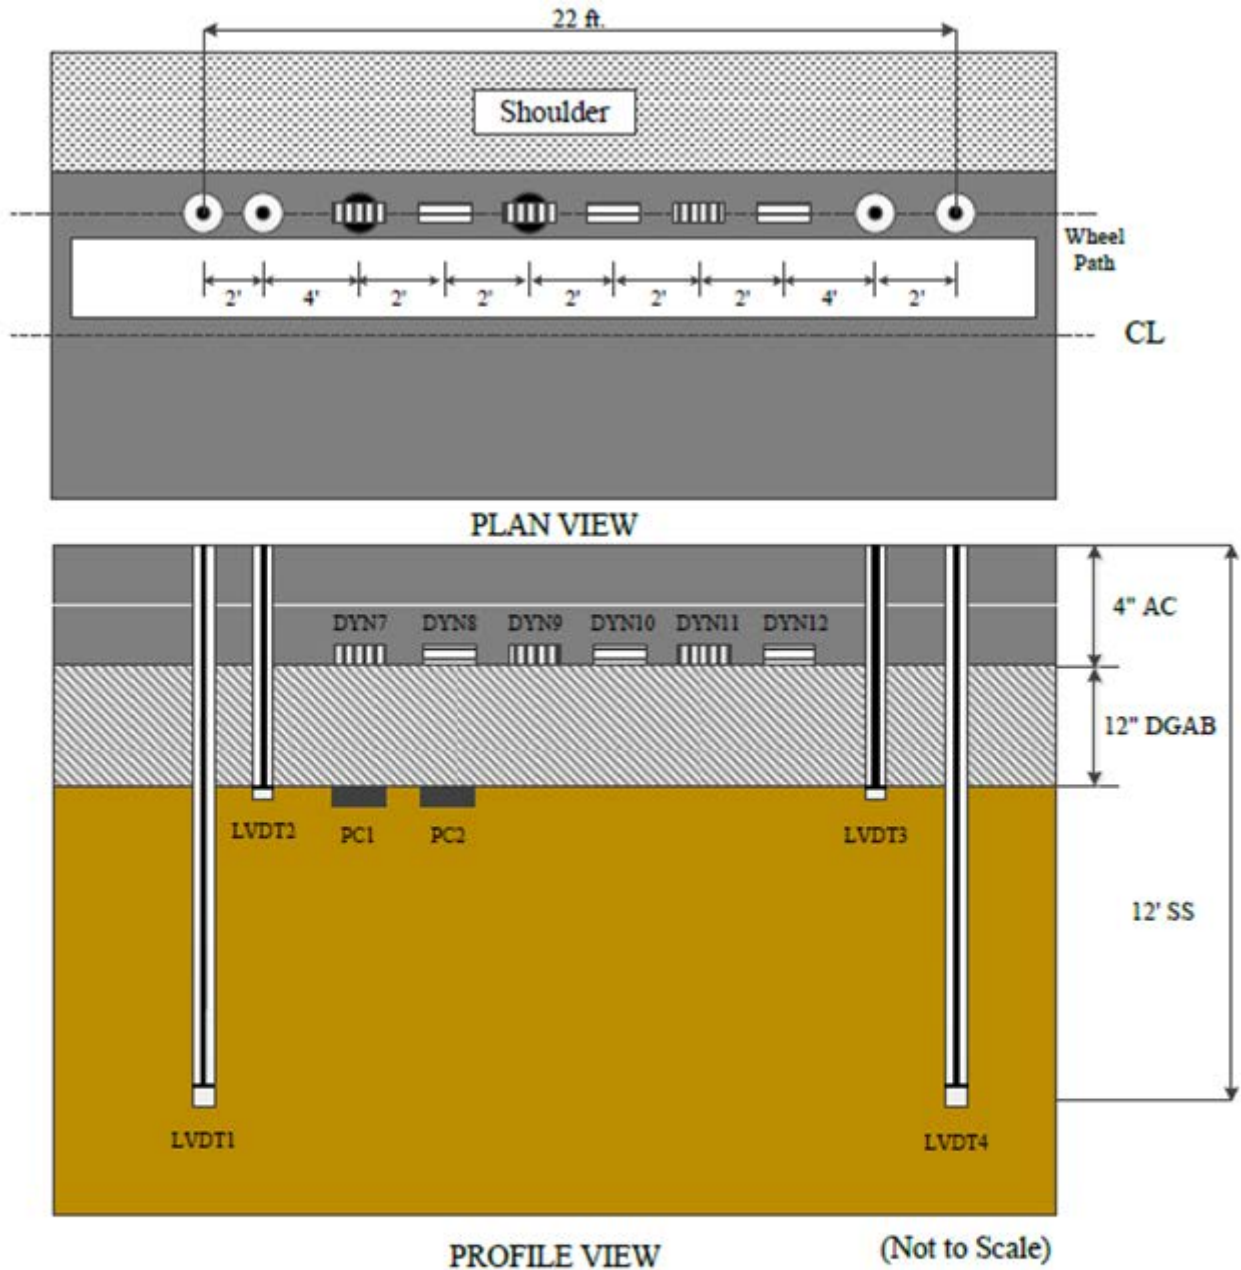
Illustration. SHRP test pavement layout.<sup>(7)</sup>
